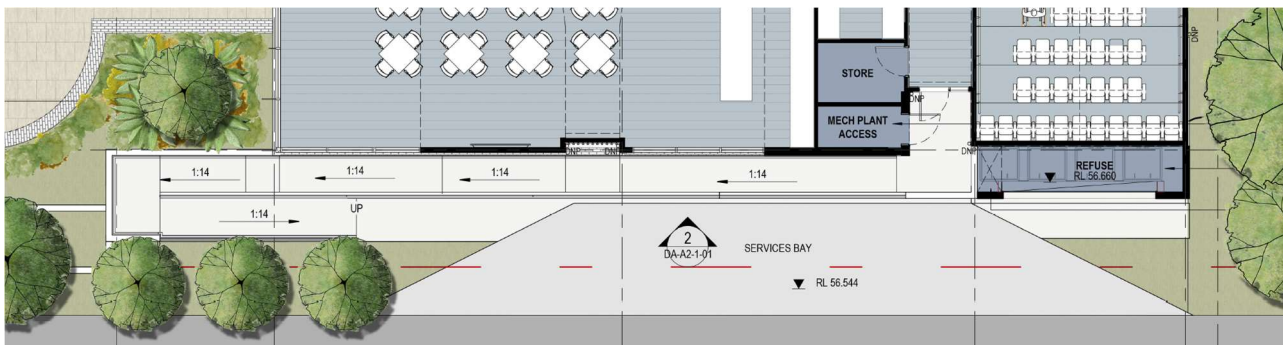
Communal Building Refuse Storage and Services Bay
